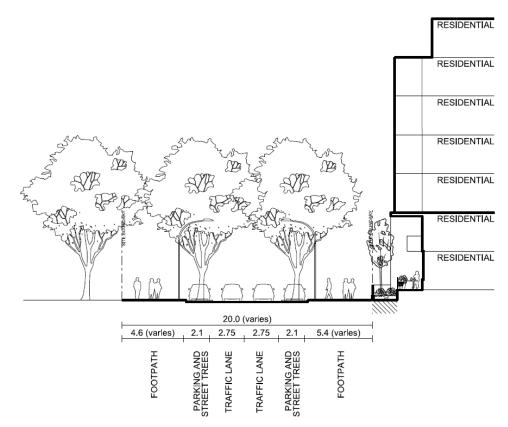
Section D – Local Street Type 1 Typical Section – 20m (Sam Sing Street north)
